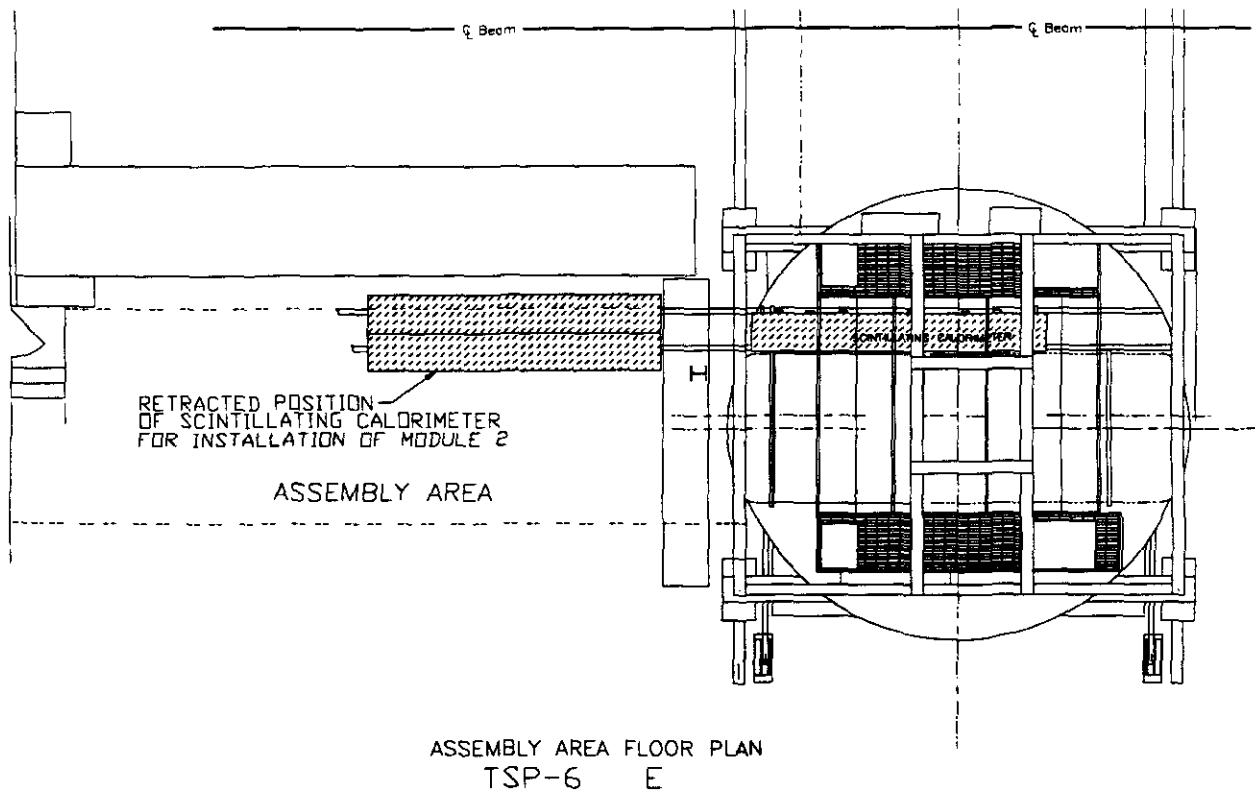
SBC Assembly Area Floor Plan in MWEST
